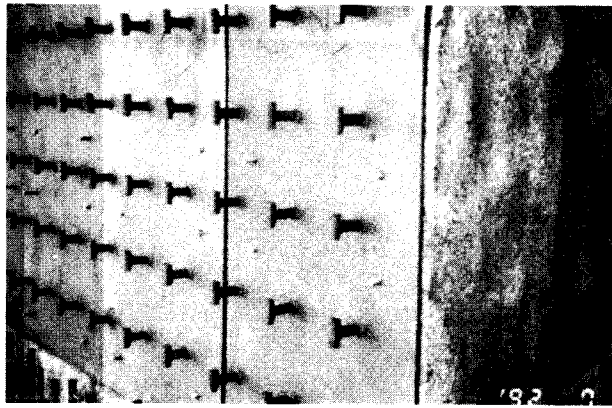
Southwest Corner of Joint after Chipping of Surrounding Concrete
